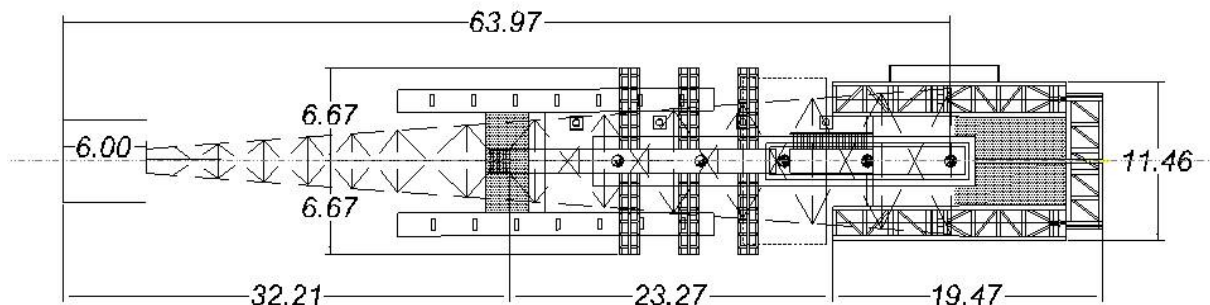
Layout of the Massarenti MR 4000 rig (unit: metres)
